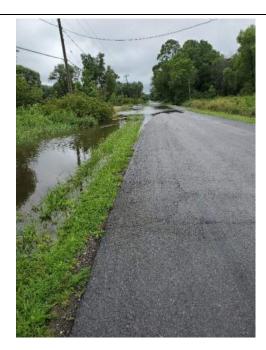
Mantua Center Road Overtopped with Flood Waters
